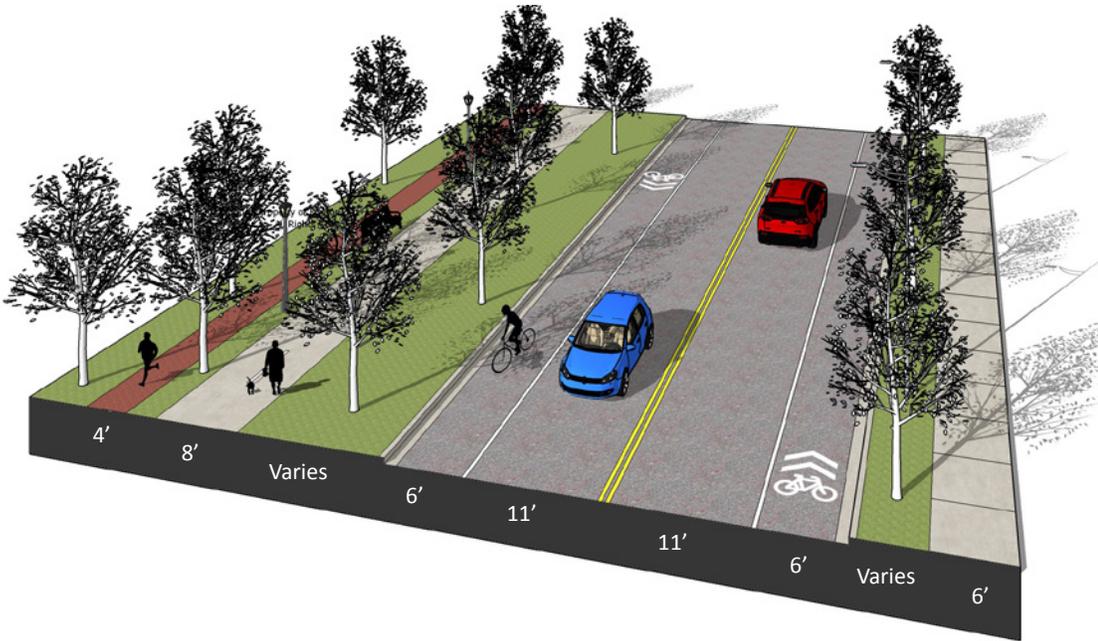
Throughout park sections, look at incorporating a soft surface trail for joggers to utilize.
